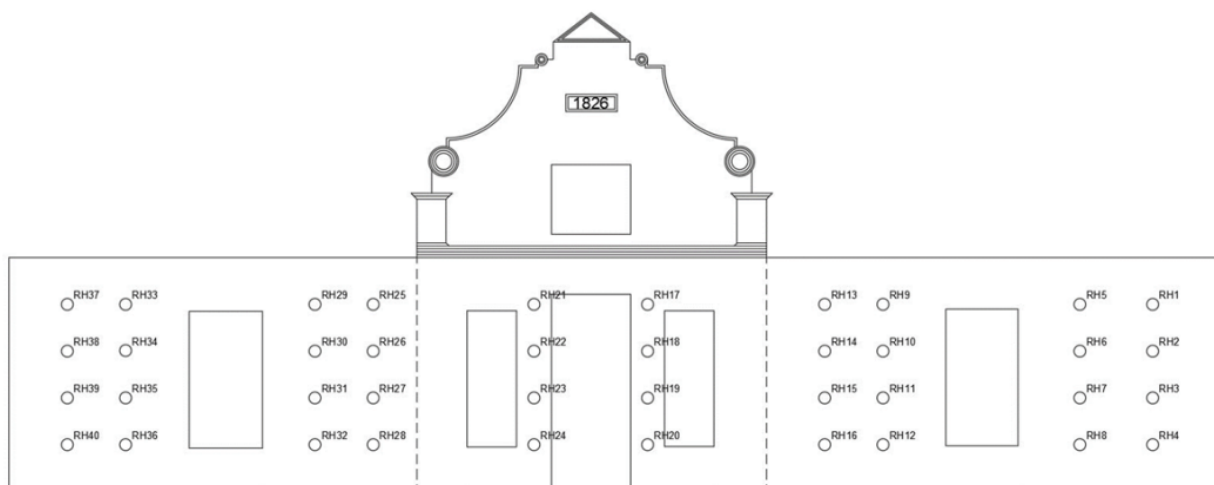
CAD drawing of rebound hammer test positions on the old masonry wall
